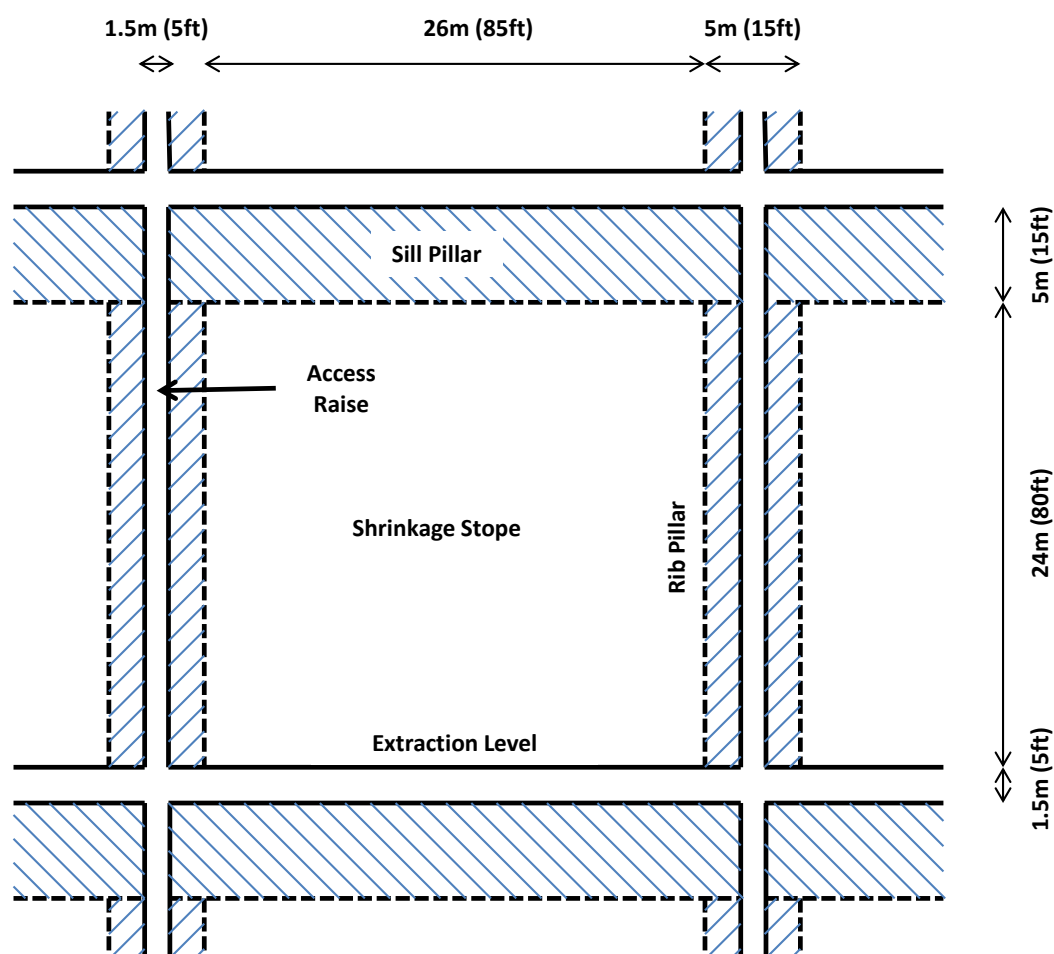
Schematic Longitudinal View of Noranda Mining Layout for Shrinkage Stopping
